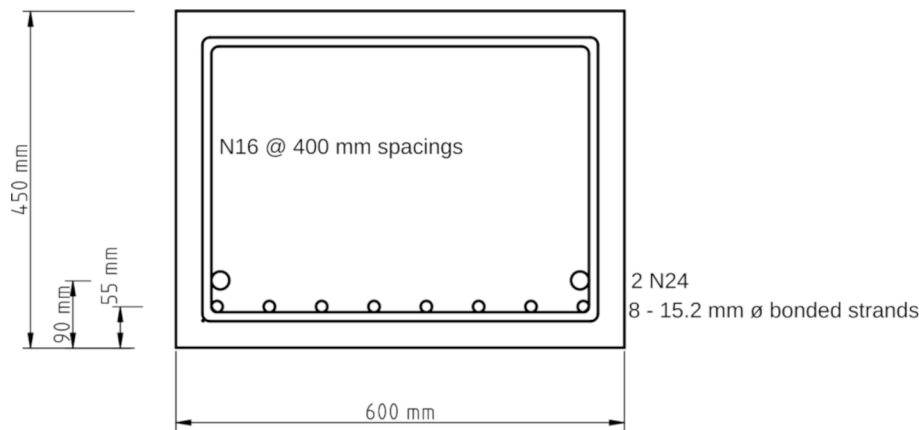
Cross-section of concrete pretensioned plank near mid-span.
